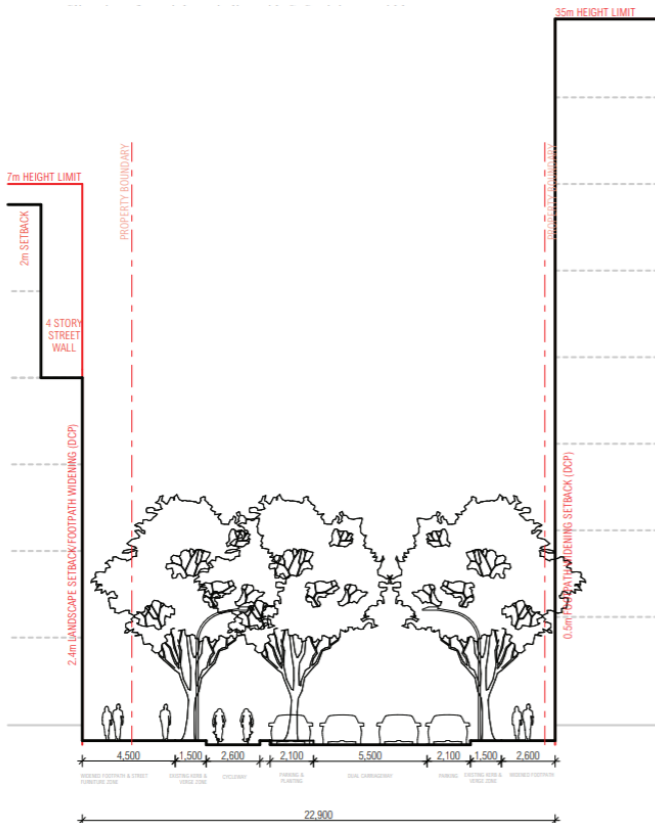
Indicative street section – Bourke Street (A), North Alexandria
